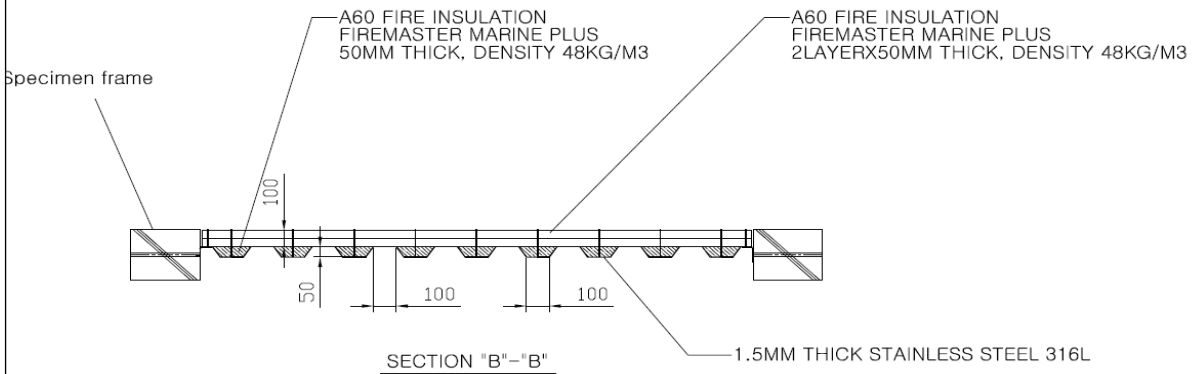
A60 Corrugated Fire Wall Construction Details
